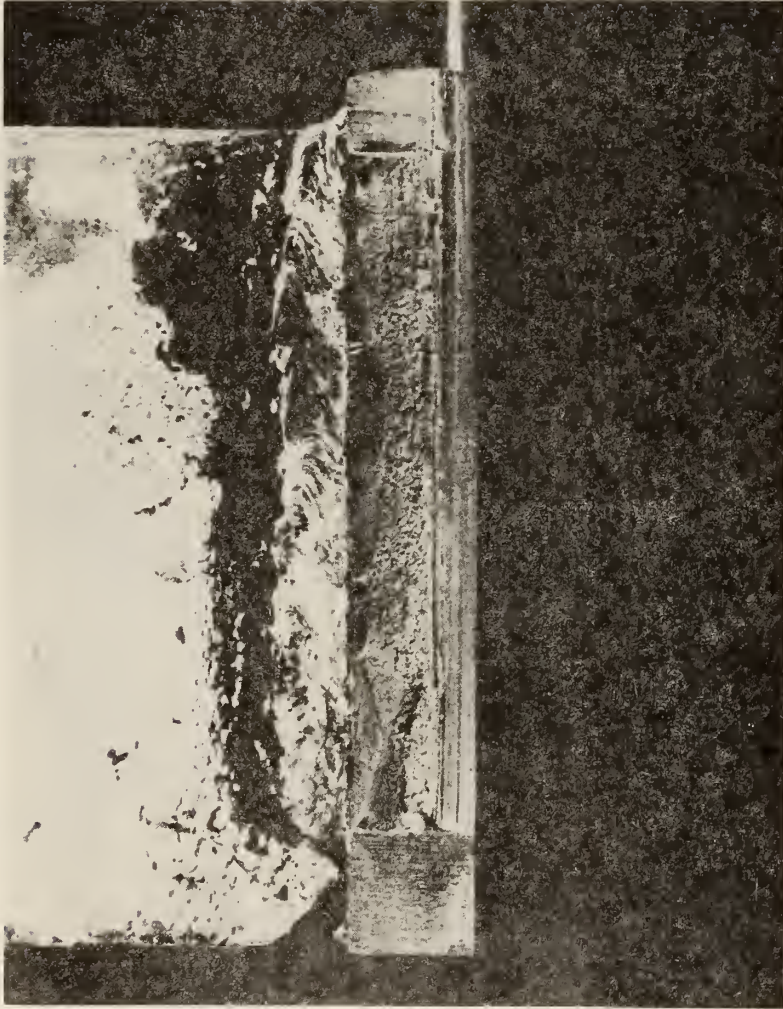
Multiple fatigue crack growth at the toe of a stiffener-to-tension flange weld.
